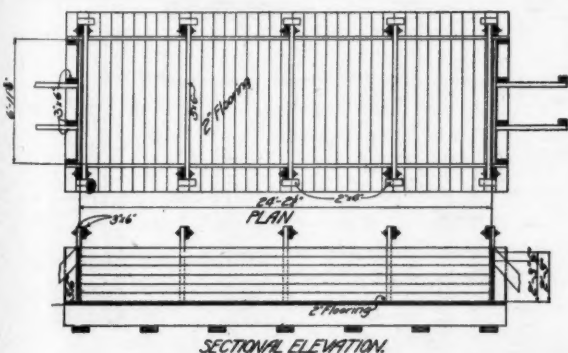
DETAILS OF FORM FOR MAKING SLABS, ROADWAY CONCRETE CONSTRUCTION, C., B. & Q. RY.
